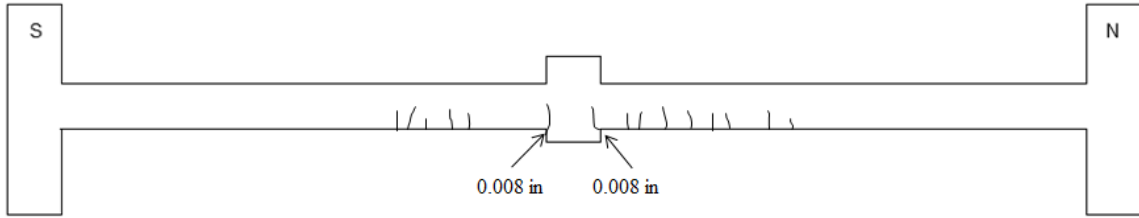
Crack pattern of Specimen 3 formed by the self-weight of the specimen during handling and positioning, and by weight of loading beam (Crack widths not indicated are smaller than 0.008 in.)
